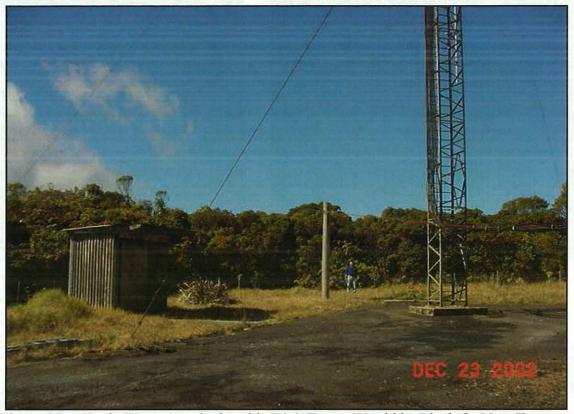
Kaala West: Attached to this FAA Tower Would be Ideal. Or New Tower at Subject's Location.
